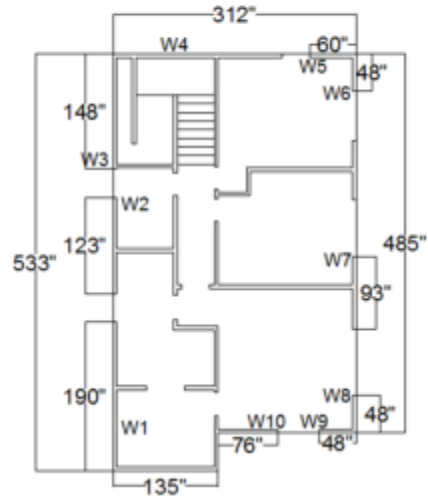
Floor Plan 1 - One-Story House without a Garage
